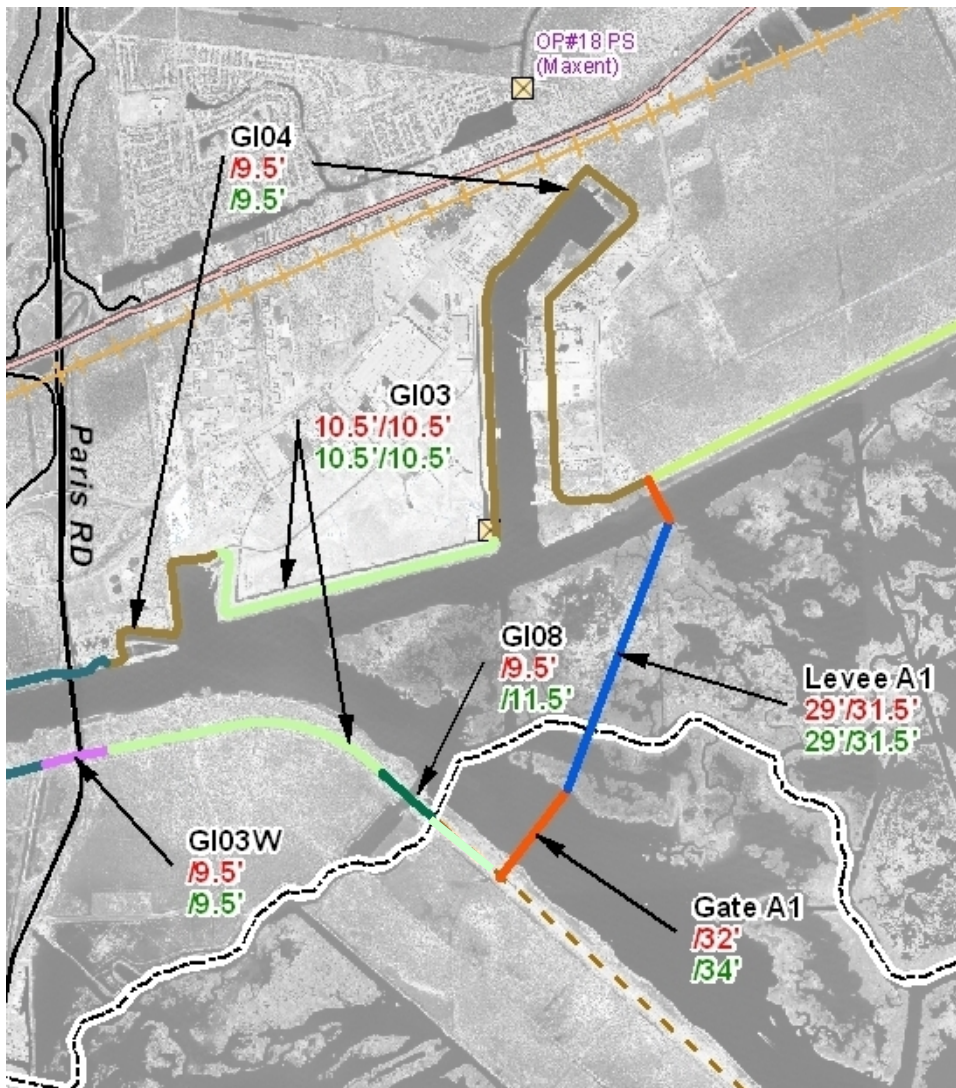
Levee and gate sections at MRGO/GIWW gates
